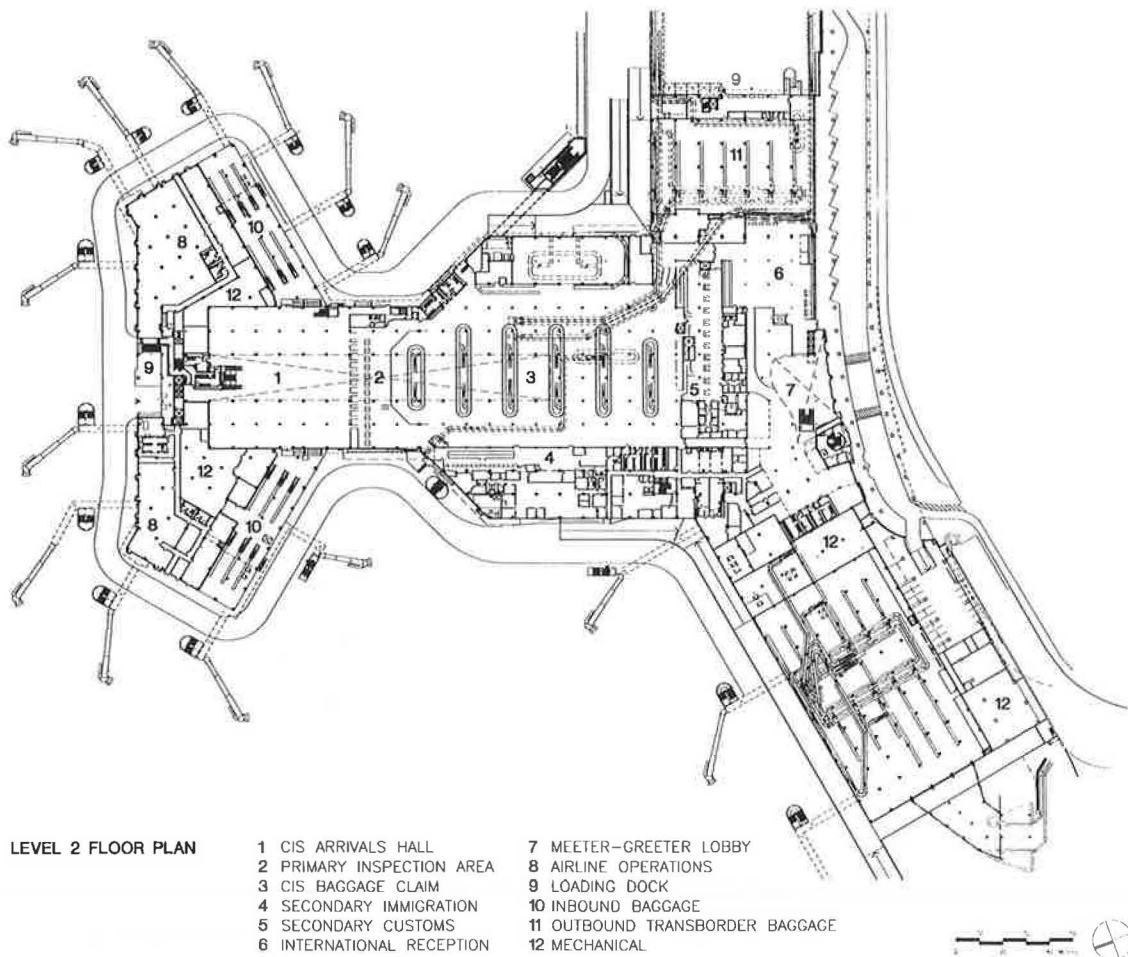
Vancouver International Terminal, level 2 floor plan.
